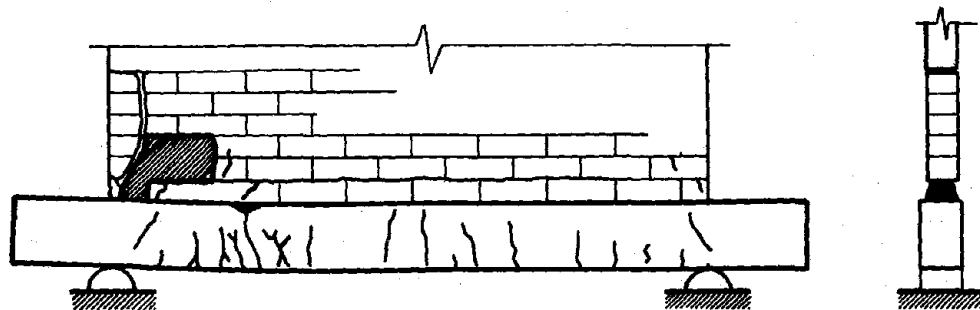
WALL FAILURE ON INTERMEDIATE RC BEAM
